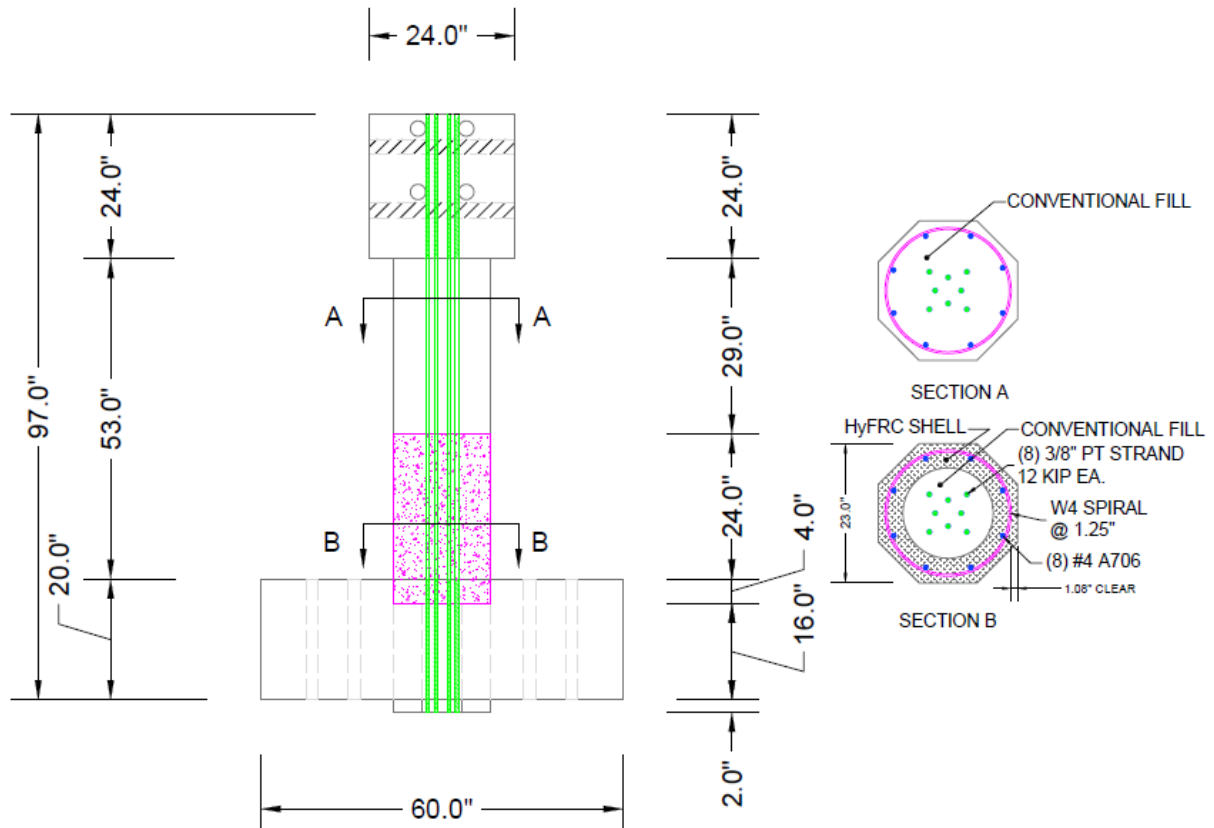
Specimen PreT-SF-FIB-SHK elevation
